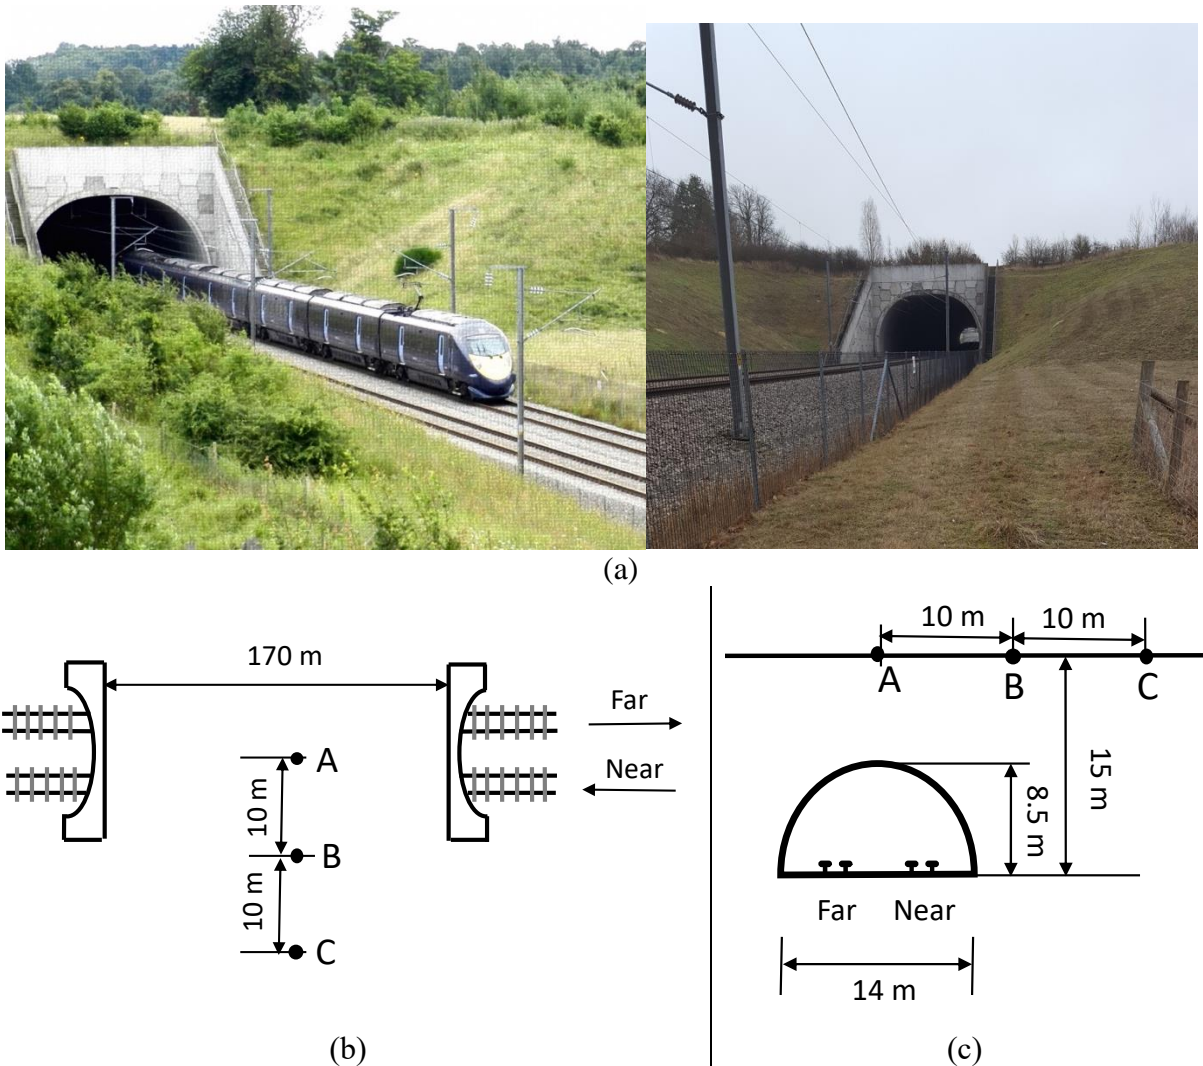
Photograph of the measurement site (a) and diagram of the measurement site (not to scale): (b) plan view (c) cross-section view
